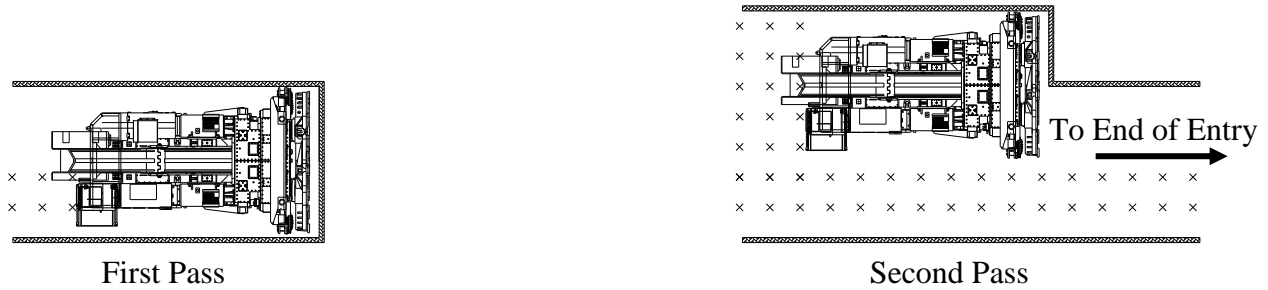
Proposed bolting procedure for full width of the boring machine. 'X's represent bolt installation locations. This installation pattern is used for 'Bolt while Mining – Full Width of Boring Machine'. Bolts can only be installed in the area outside the overlap of the machine between the two passes, the half of the entry along the right pillar.
